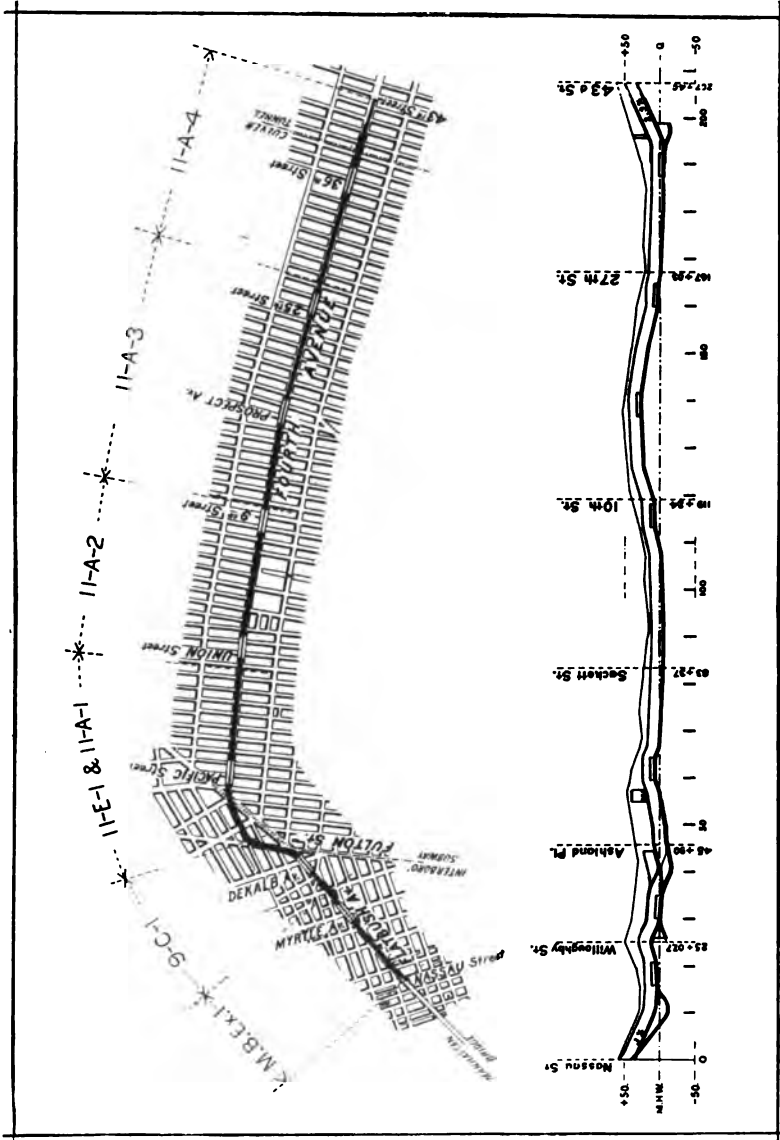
PLAN AND PROFILE—SUBDIVISION INTO CONTRACTS.
